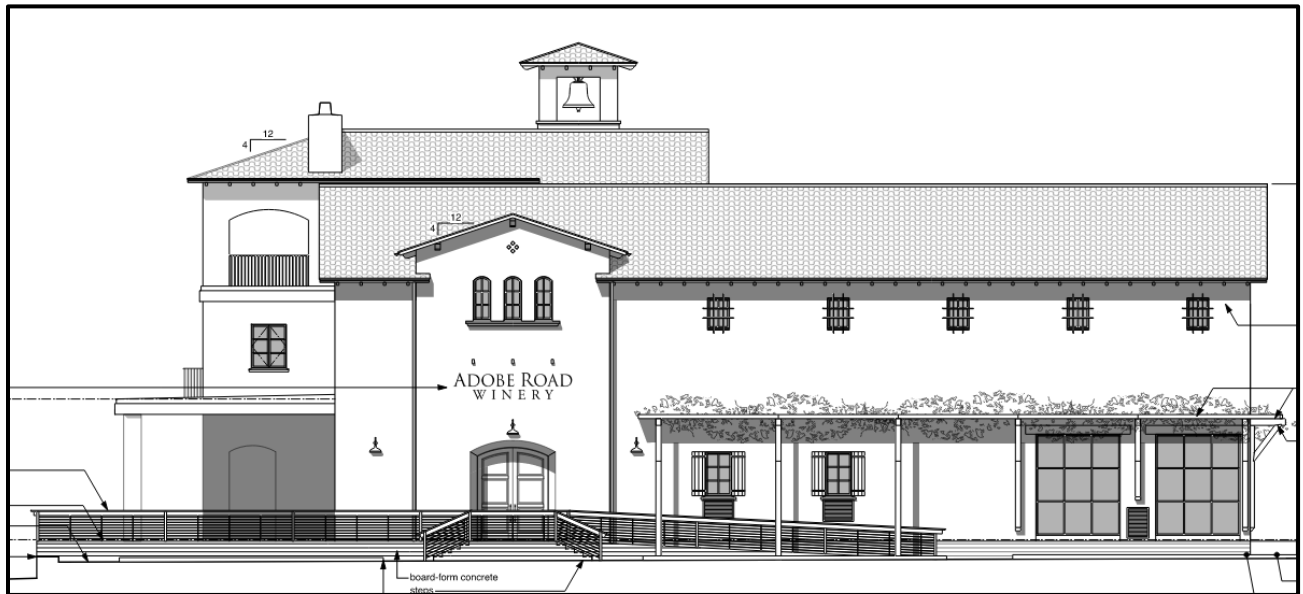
C Street Elevation – Modified (Attachment E, Sheet A3.01)
